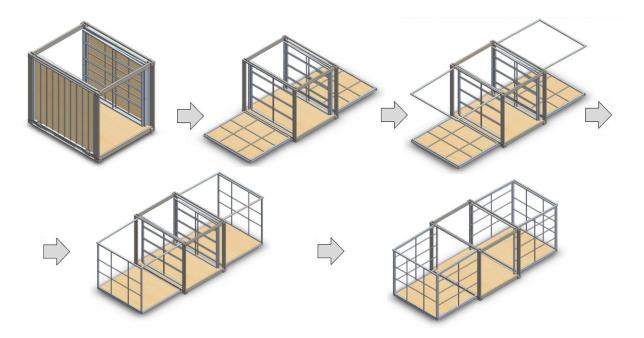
Unfolding shelter steps. This figure shows, in order, the steps necessary to properly unfold the shelter from the container foundation. Lower the two floor panels, lift the ceiling panels, lift the far wall panels, and finally pull-out the four side wall panels. Refolding the shelter is obtainable by reserving the order illustrated.
